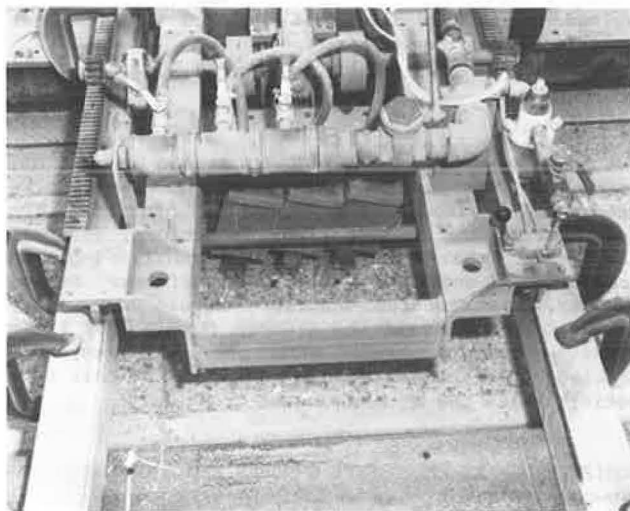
Machine for installing reflex-percussive grooves in the test sections.
